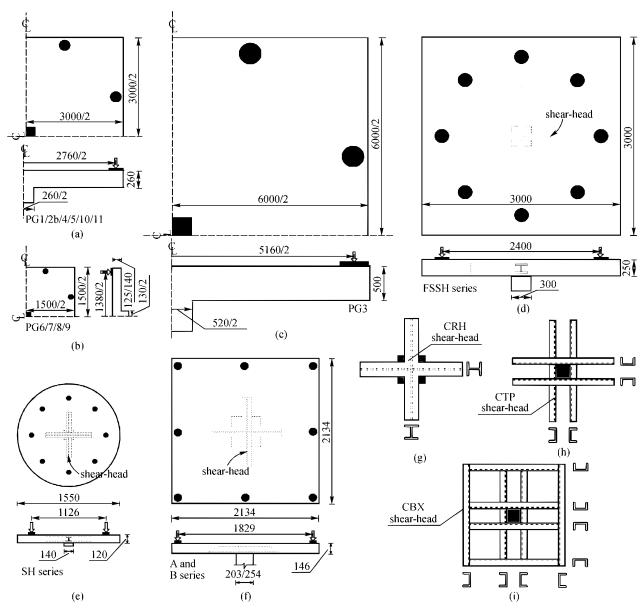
Schematic representation of specimens numerically studied in [Bompa and Elghazouli \(2020\)](#); a) Full scale specimens PG1, PG2b, PG5, PG10, PG11; b) Half scale specimens PG6, PG7, PG8, PG9; c) Double scale specimen PG3 from [Guandalini et al. \(2009\)](#); d) FSSH series; e) SH series from [Chana and K. \(1996\)](#); f) A and B series ([Hawkins and Corley, 1973](#)); Cruciform shear-heads made of g) Welded back-to-back channel or I sections (CRH); h) Two pairs of channels at the support region (CTP) shearheads; i) Closed-box shearheads (CBX).
